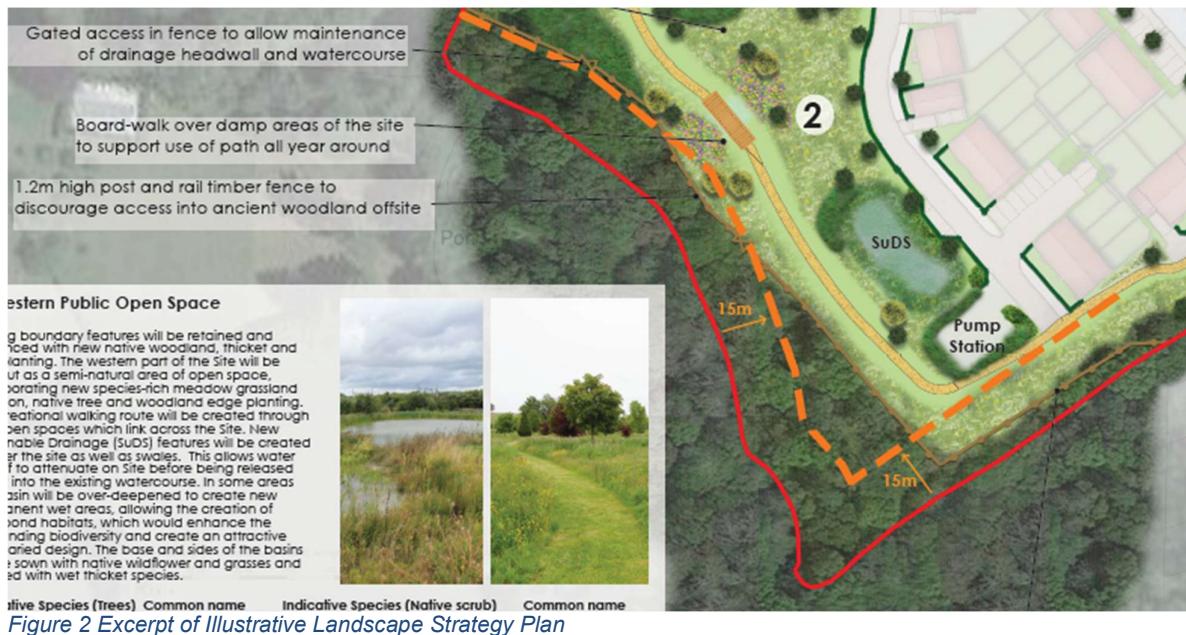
Excerpt of Illustrative Landscape Strategy Plan
